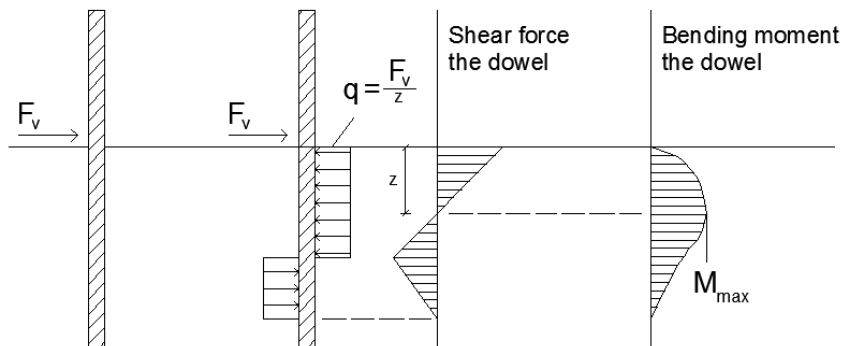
Force transfer by dowel action in a reinforcement bar, screw or a dowel (Betongelementföreningen, 1998).
